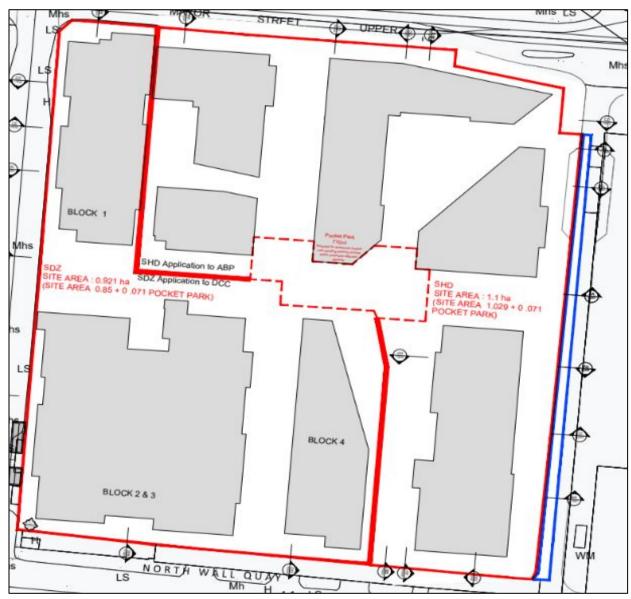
Extract of Dwg. No. P0003, 'Proposed Site Layout – Masterplan', prepared by HJL, showing the Proposed Site Layout Plan for City Block 9. Source: HJL, January 2021. Cropped by TPA, January 2021.
